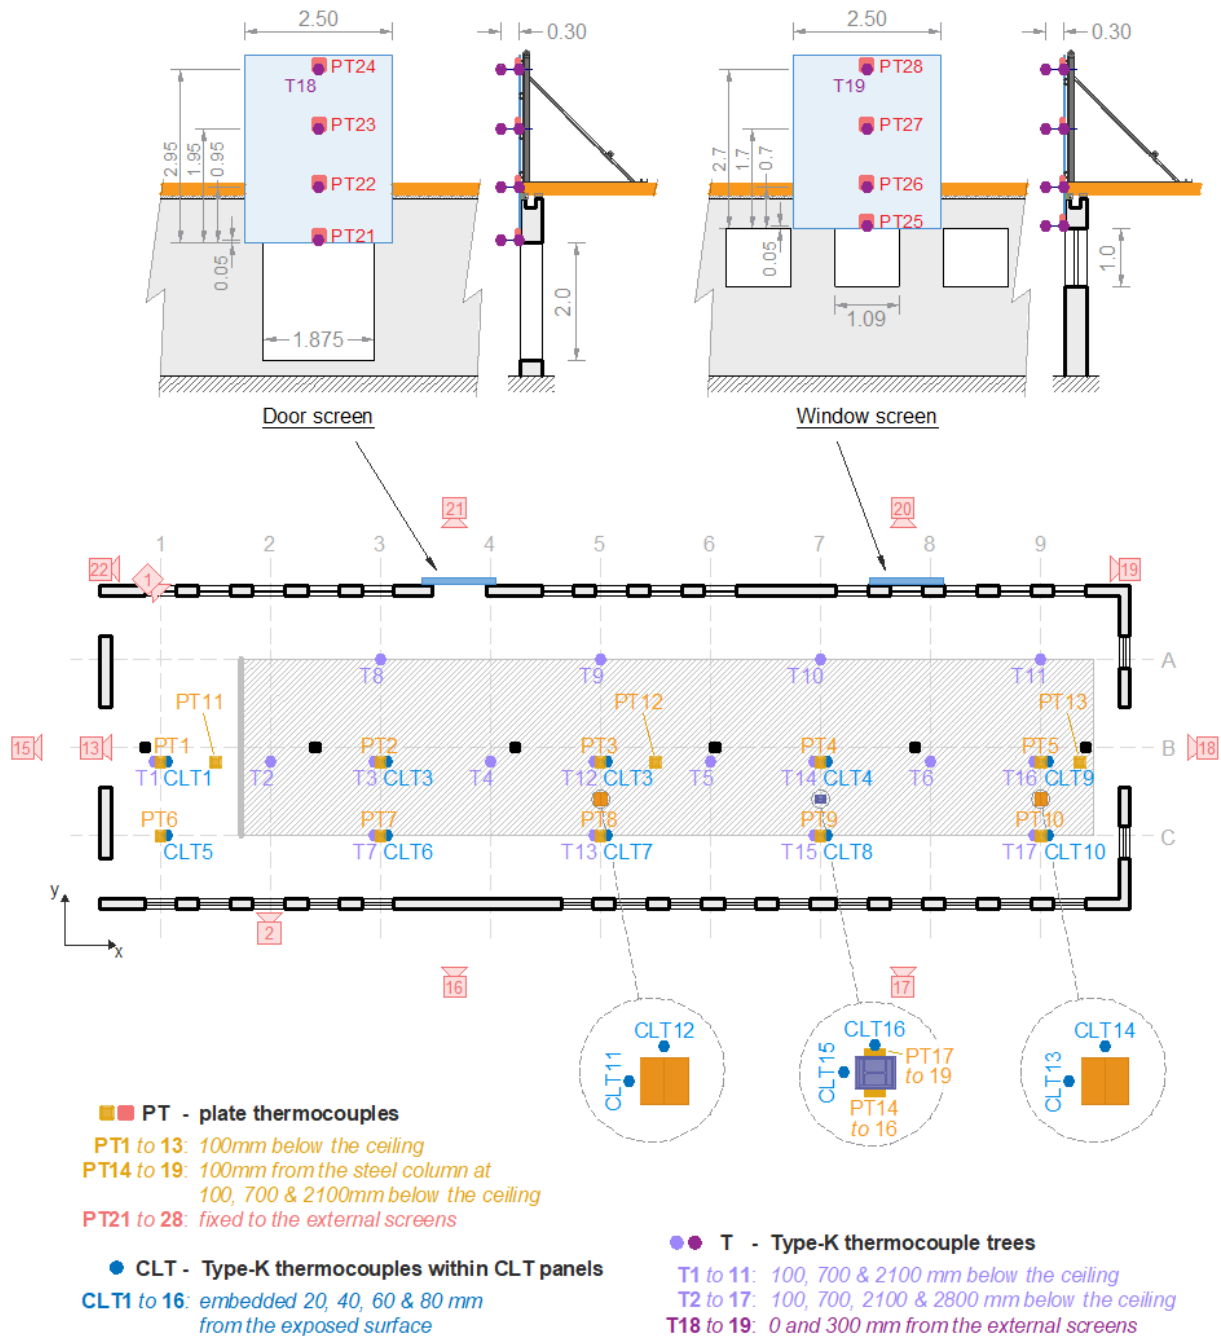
Overview of the instrumentation layout within the compartment, CLT ceiling, and external screens at the door and window openings.
